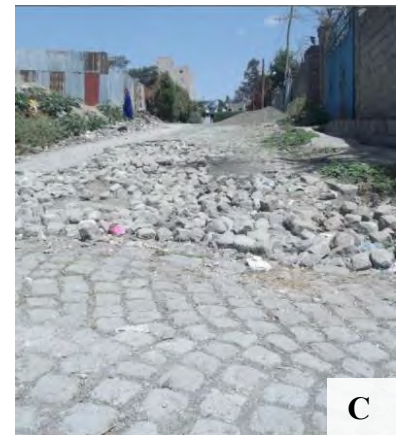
24 Fragmented cobblestone pavement Source: Fieldwork (2016)
